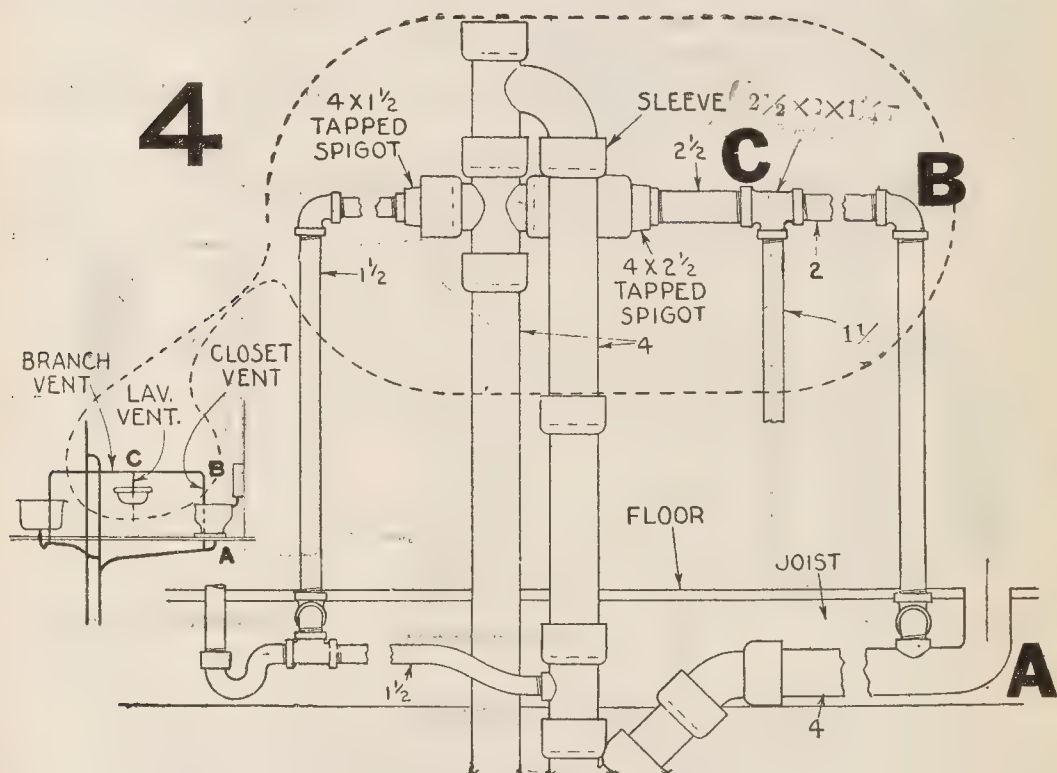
,997.—Elevation of roughing in for bath room; installation having *soil and vent stacks or loop*, and provided with "tapered" branch vent pipe instead of vent separately connected to main vent pipe. The enlargement at the right shows in detail the piping of the system indicated in the skeleton sketch.
